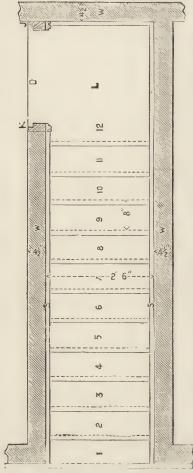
Plan of Staircase shown in section by Fig. 13.
